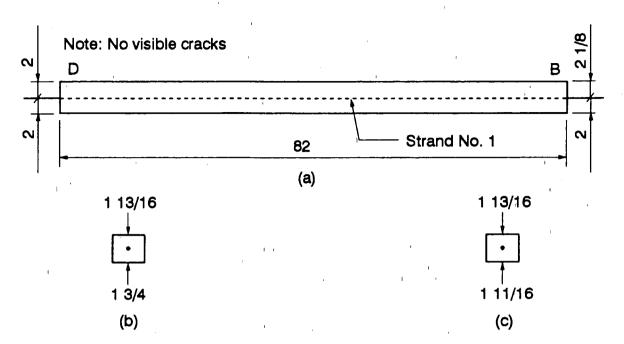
Specimen No. 10-3.5TU-5 (dimensions shown in inches):
